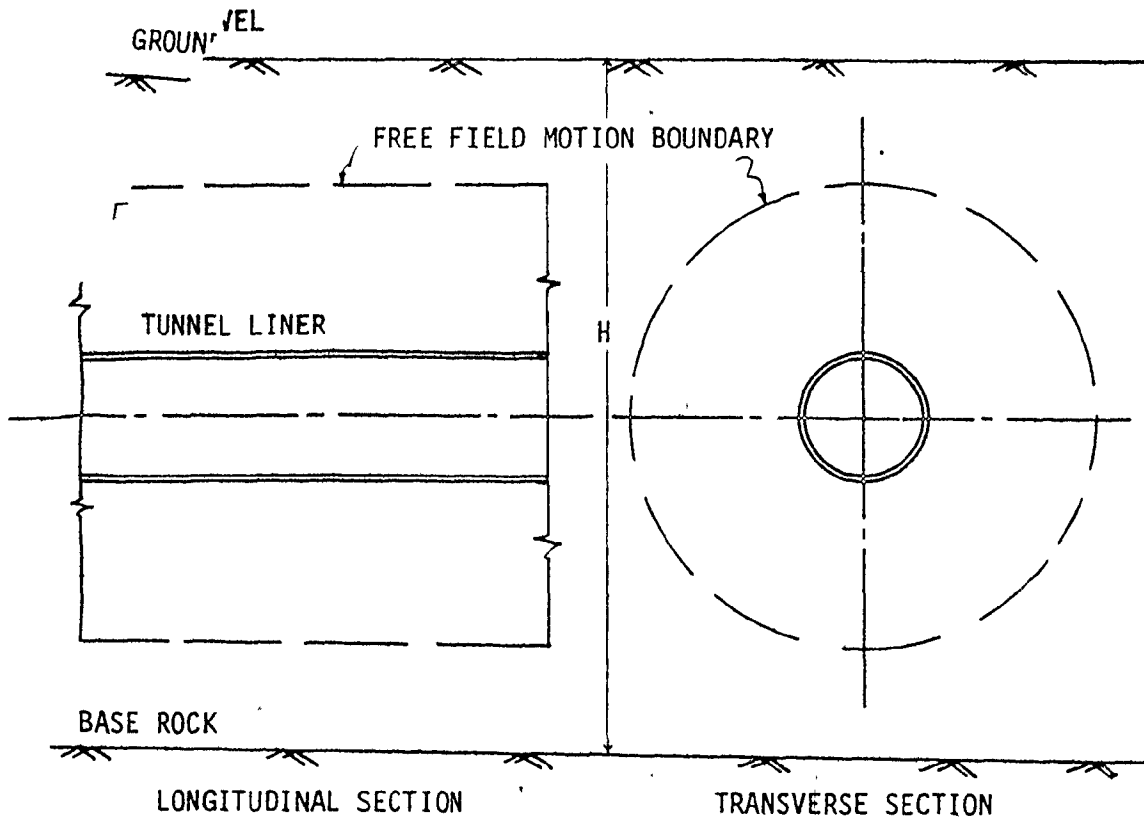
SINGLE LAYER SYSTEM WITH TUNNEL
